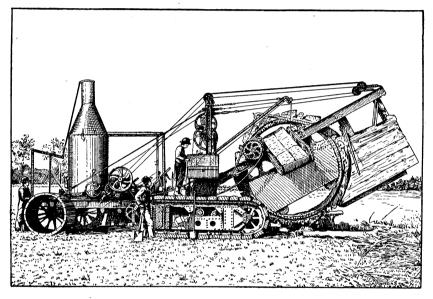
Wheel machine F, equipped with shield for use in caving soil.
